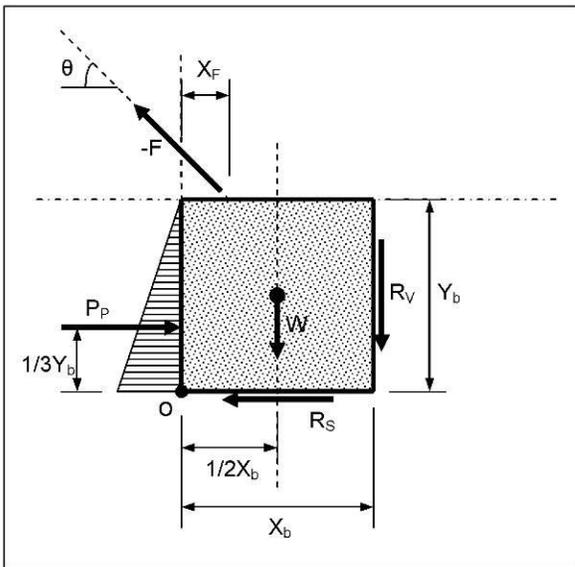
Statics of cast-in-ground mass anchors subject to tension forces in attached brace
